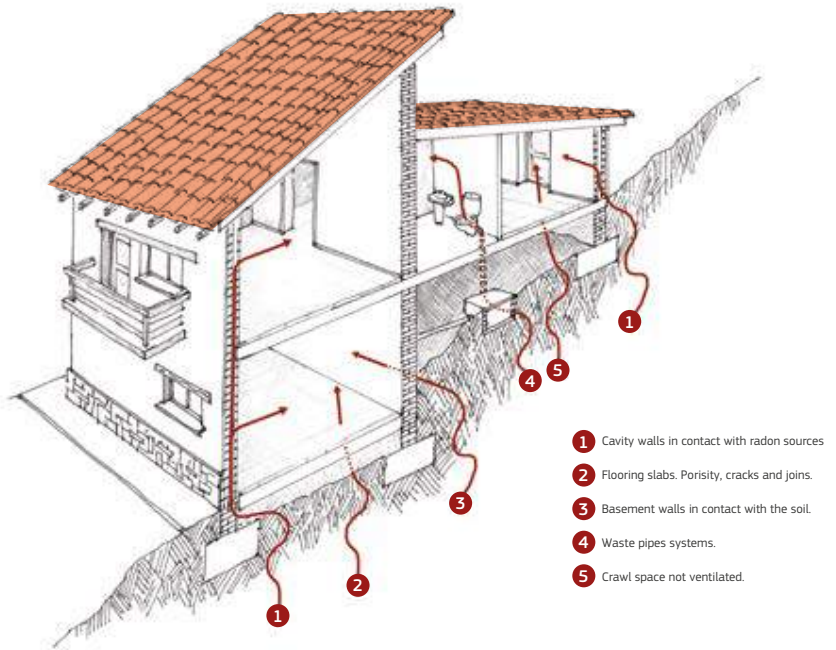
Main sources of radon gas entry into a house. Source: Figure created by Borja Frutos Vázquez.
